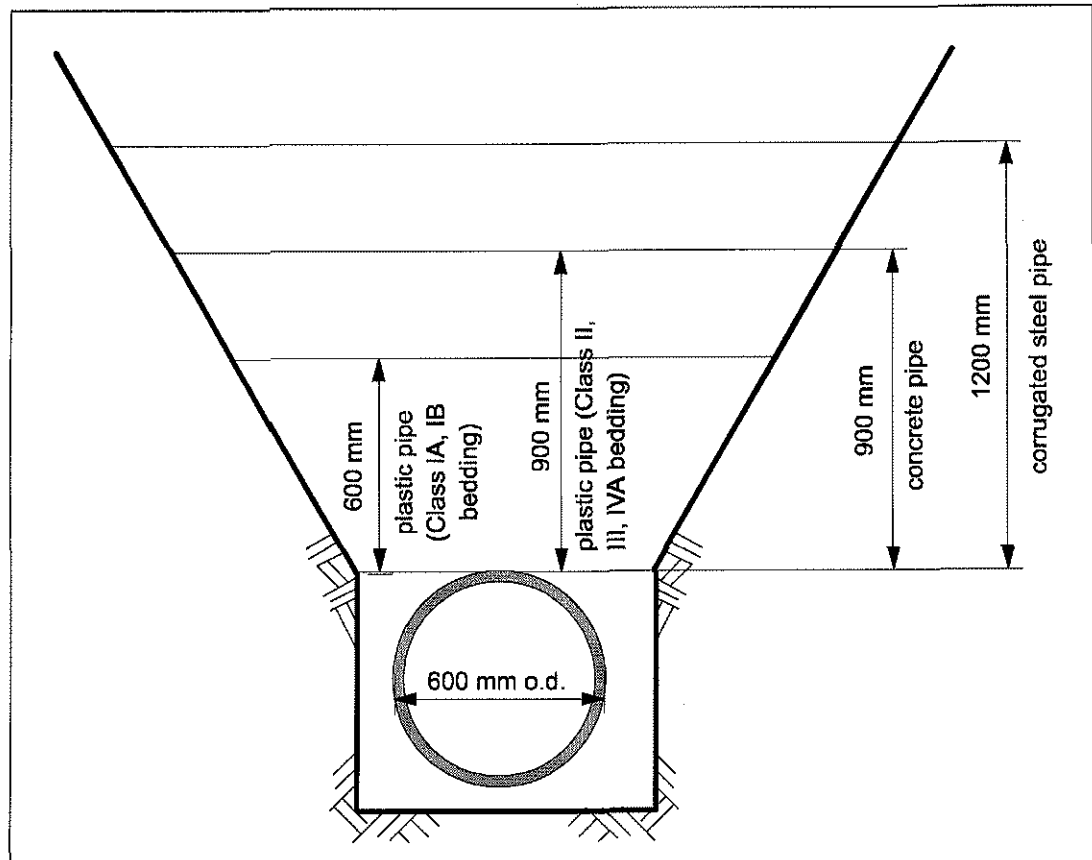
A comparison of trench width for concrete, PVC and HDPE pipe
